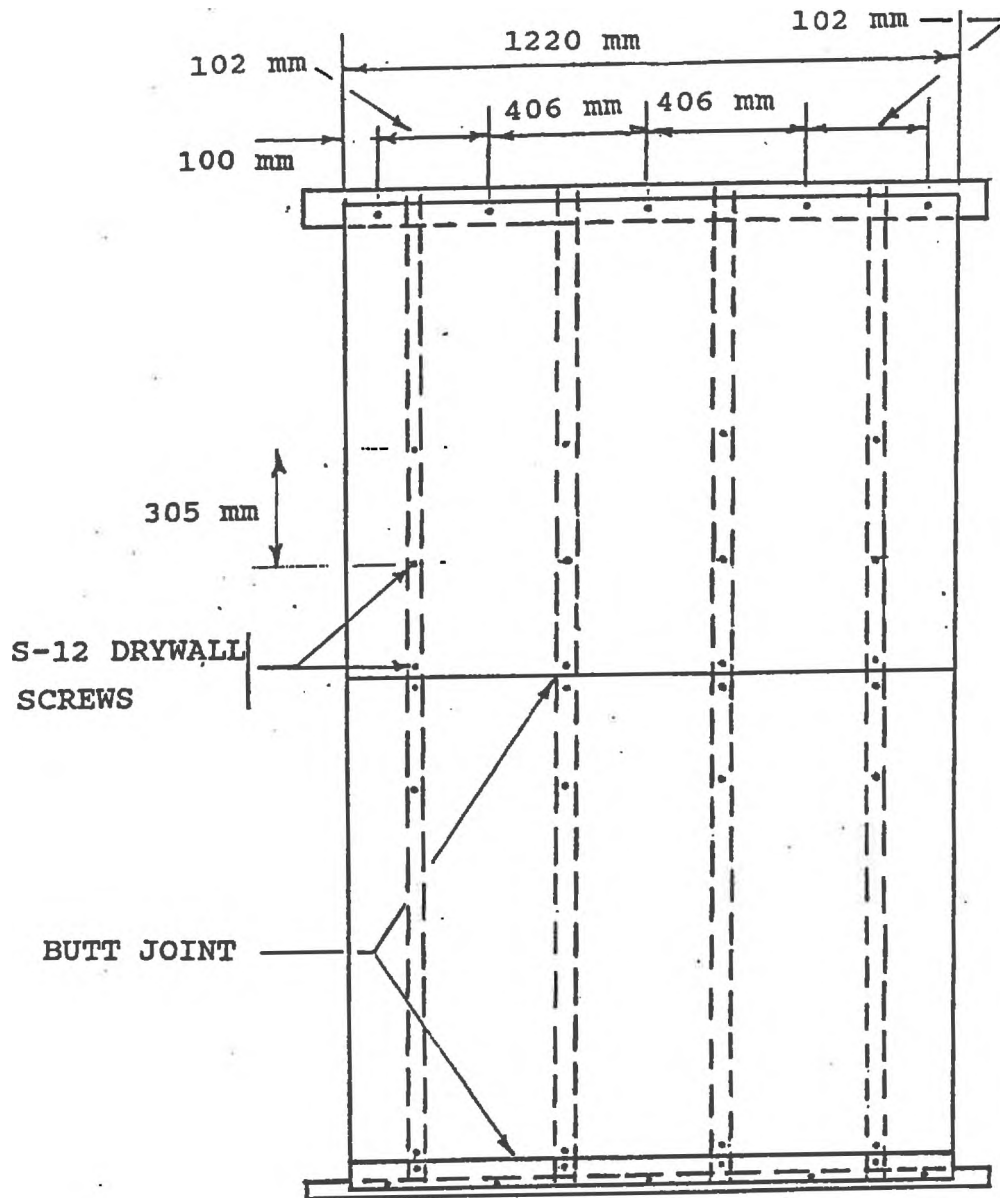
Typical 4 Stud Panel Showing Screw Locations for Interior Drywall Sheathing
